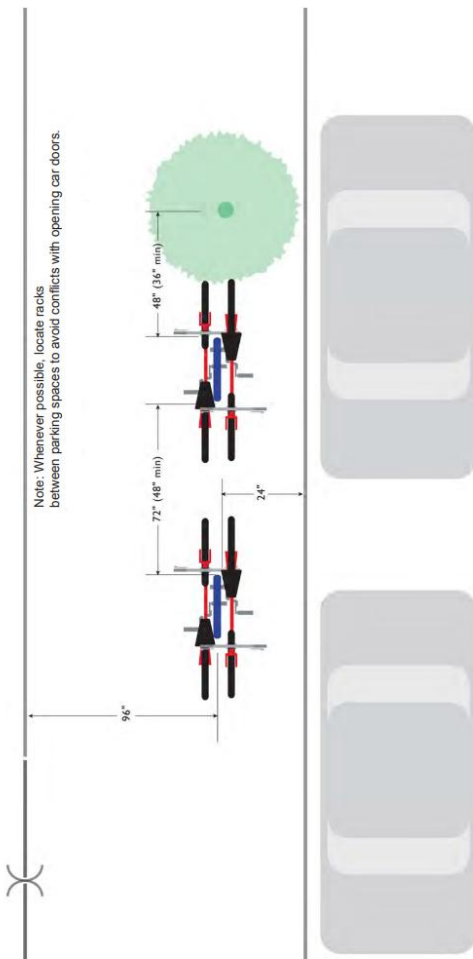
Typical Layout of Parallel Sidewalk Bike Parking Installations (Source: APBP<sup>2</sup>)
